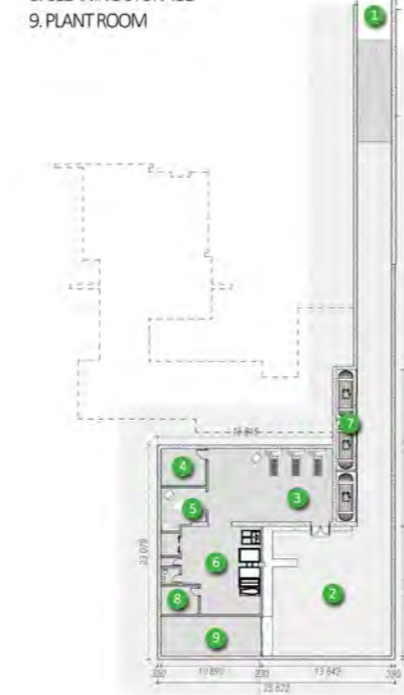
Garden layout with possibility for future extension, (Author, 2020)
